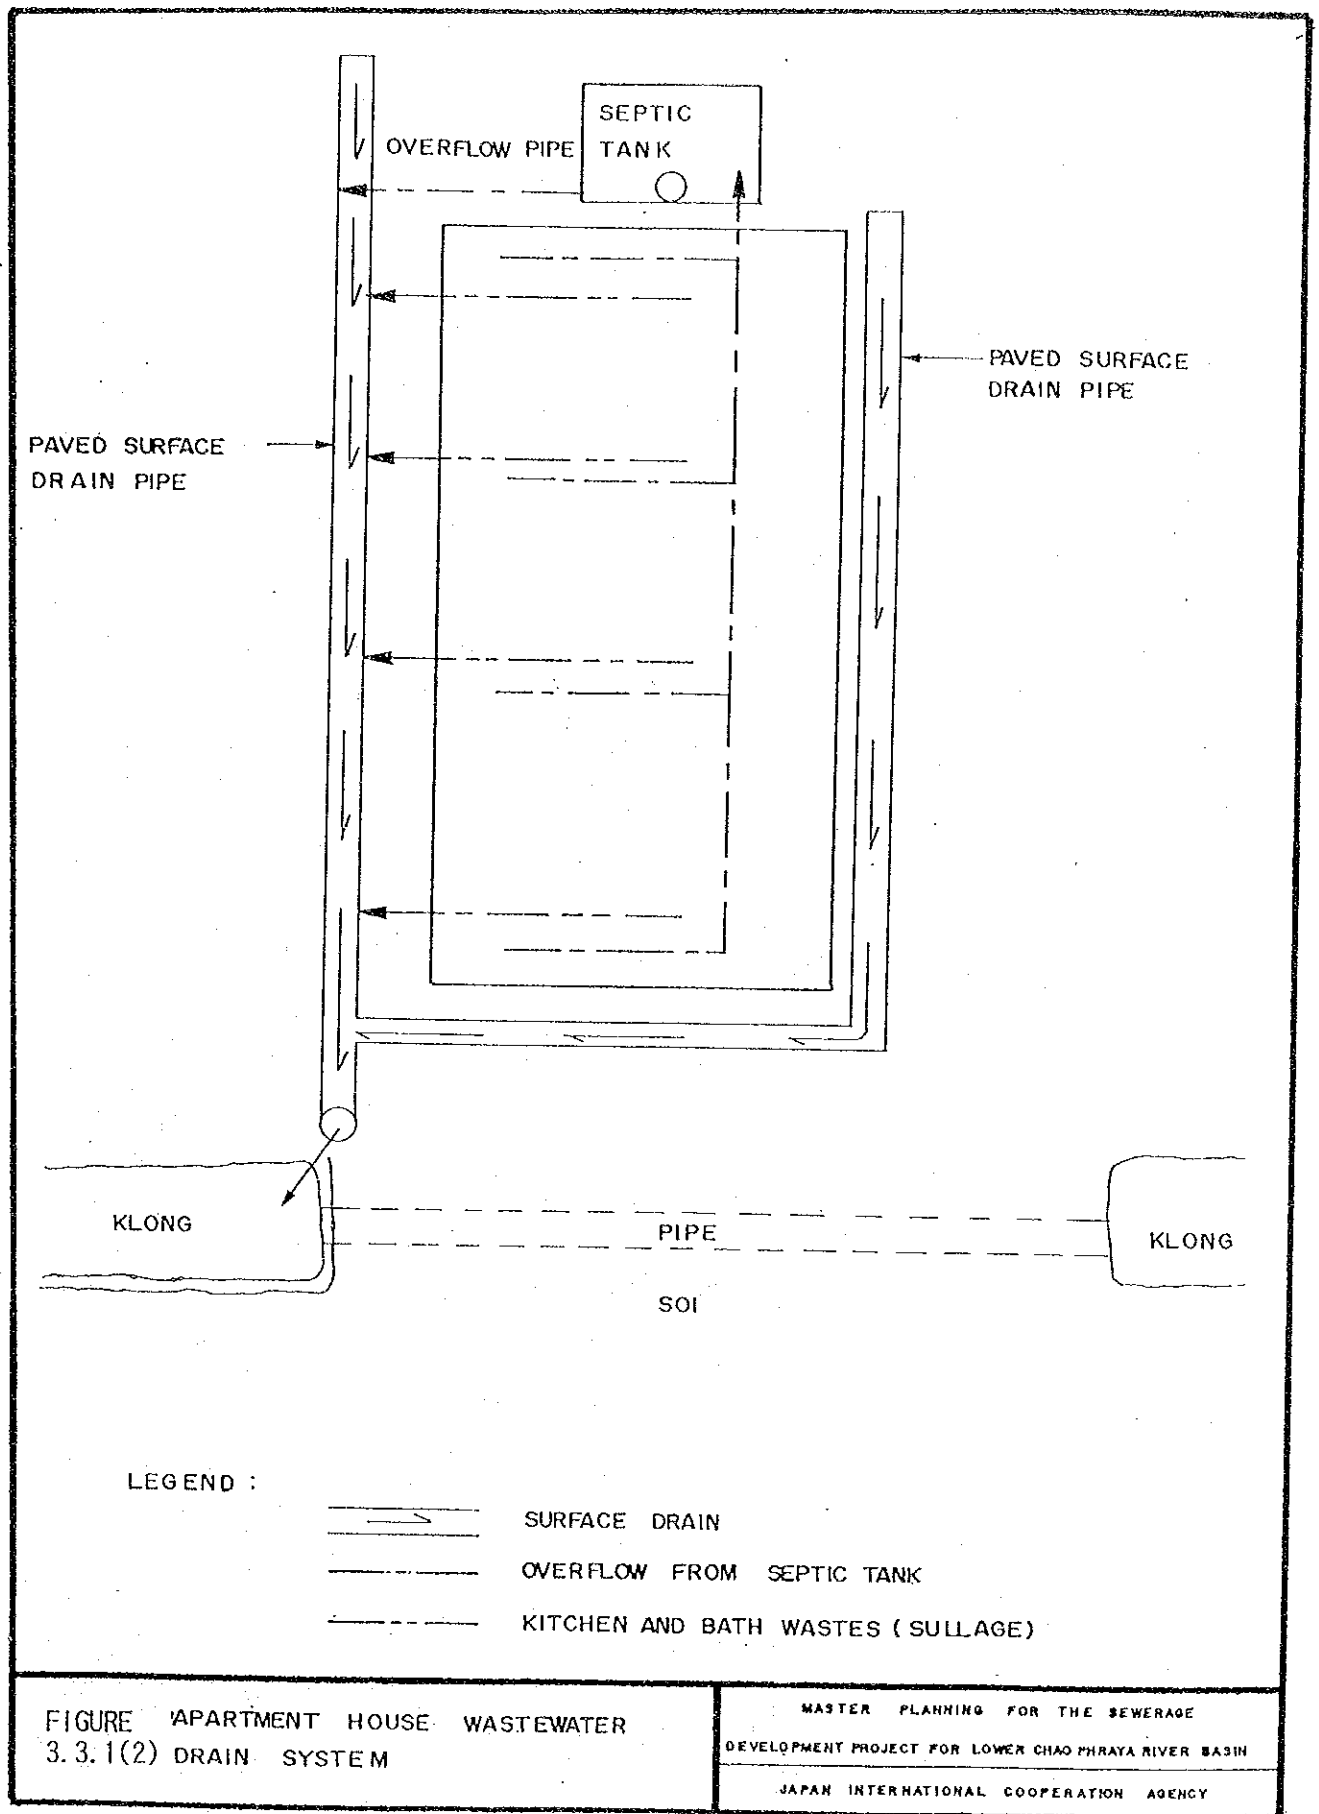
(2) APARTMENT HOUSE WASTEWATER DRAIN SYSTEM
